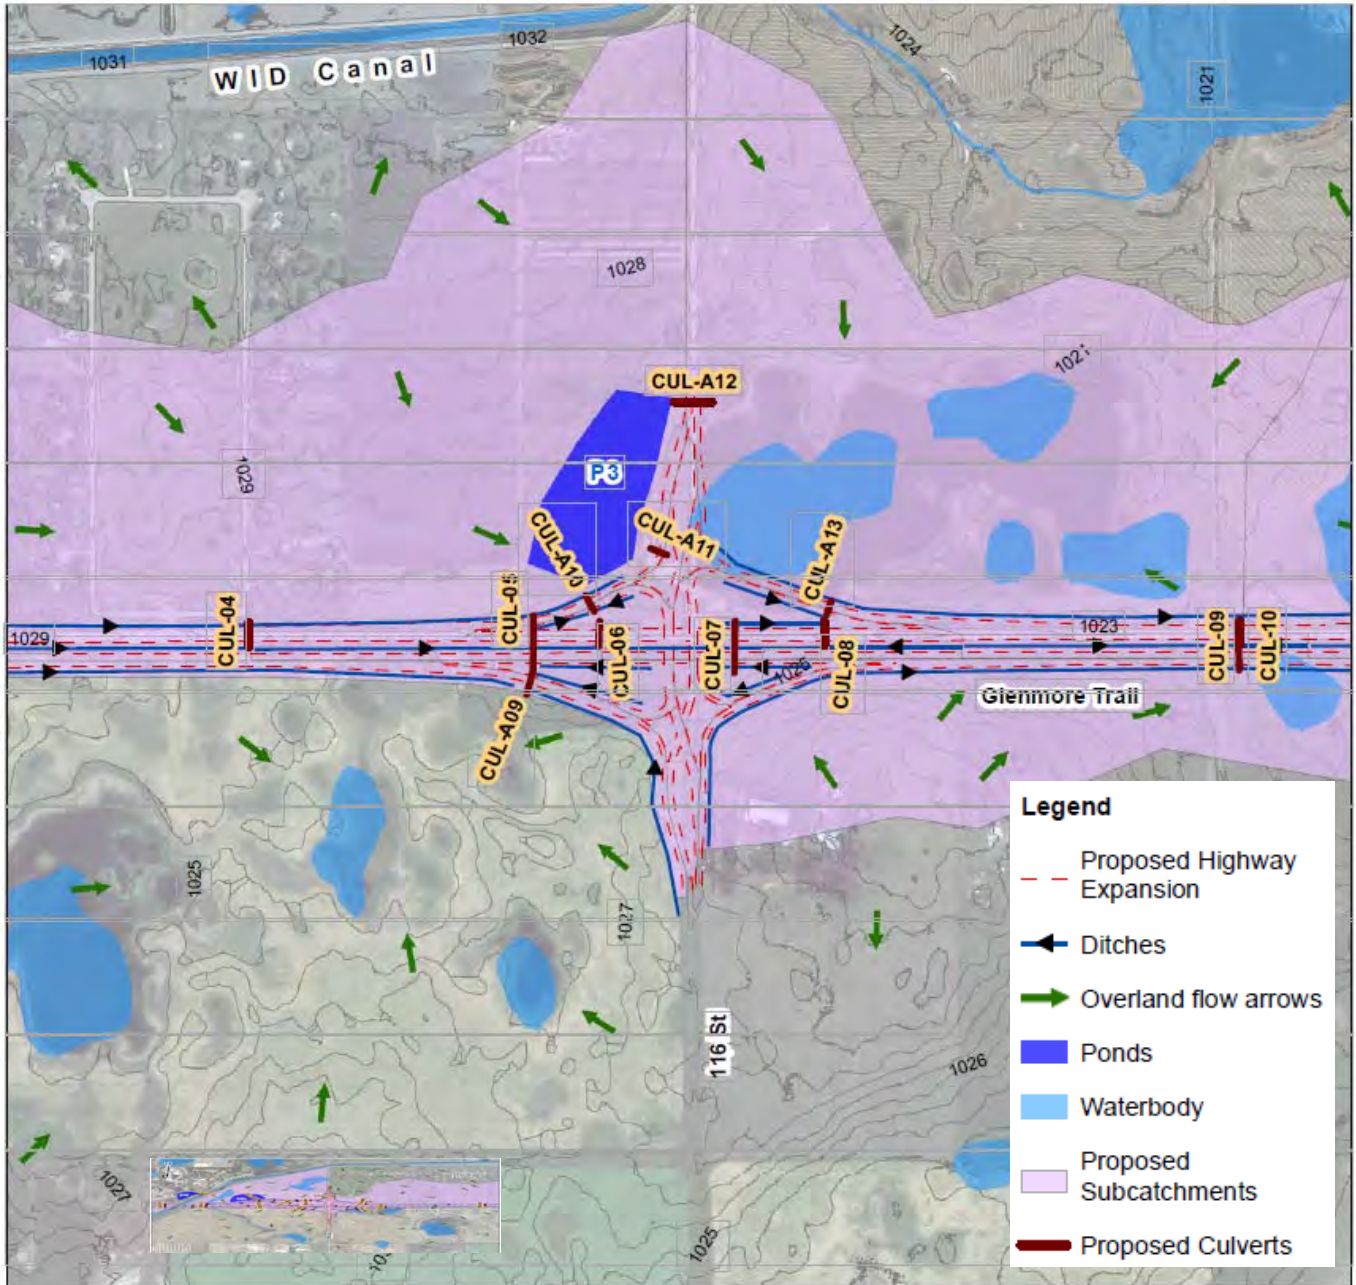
116 ST SE INTERCHANGE STORMWATER AND DRAINAGE PLAN
